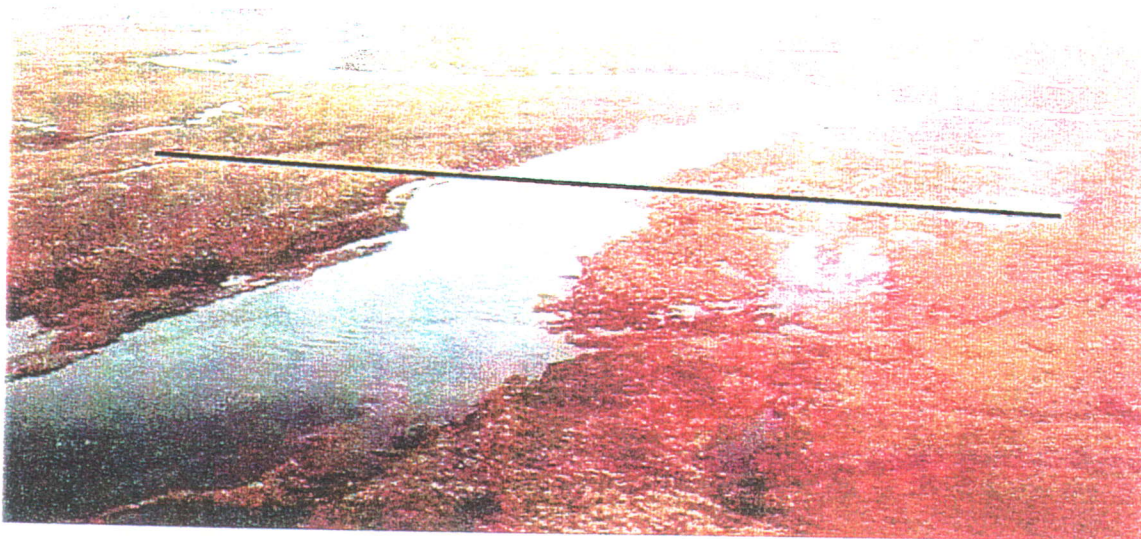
Looking north at the proposed pipeline crossing (6/2/98).
